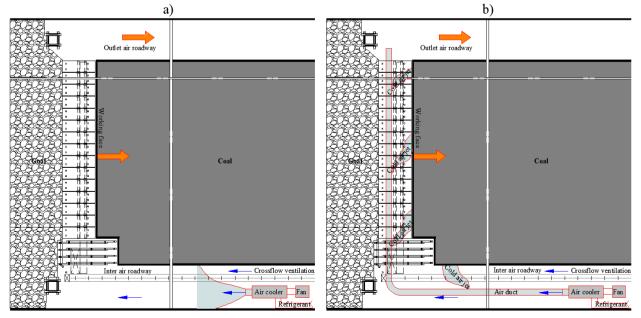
Diagram of cooling solution using the air conditioner in the longwall face area: a) cooling the entire tunnel and longwall face space; b) segmental cooling for each working position of miners.
